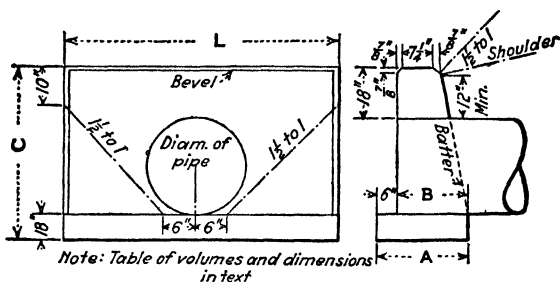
Headwall for pipe culvert (Kentucky practice).
